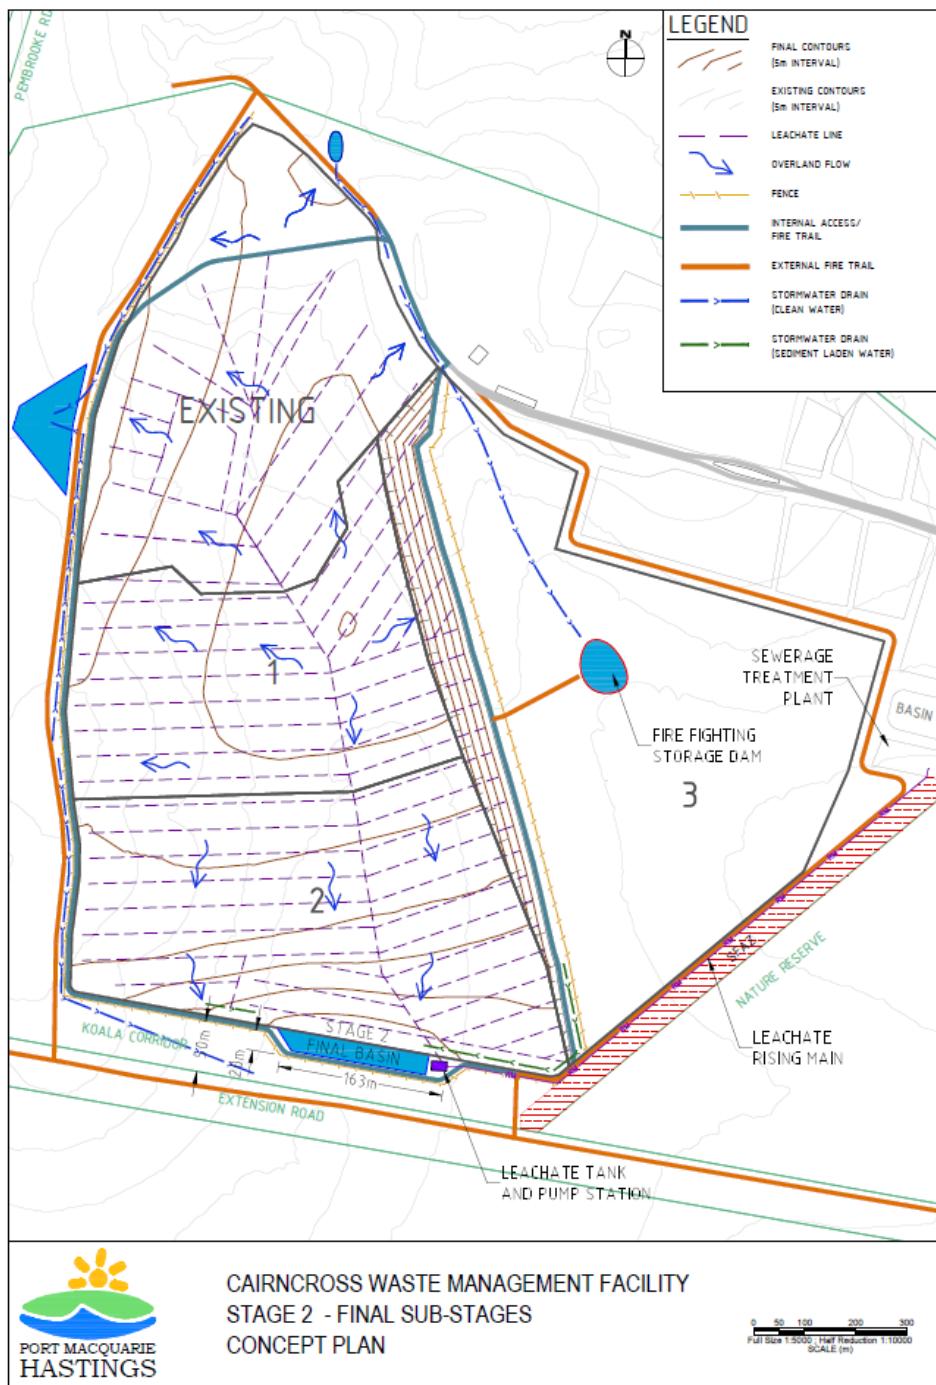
Amended Proposal layout Stage 2 Final Sub-Stages
